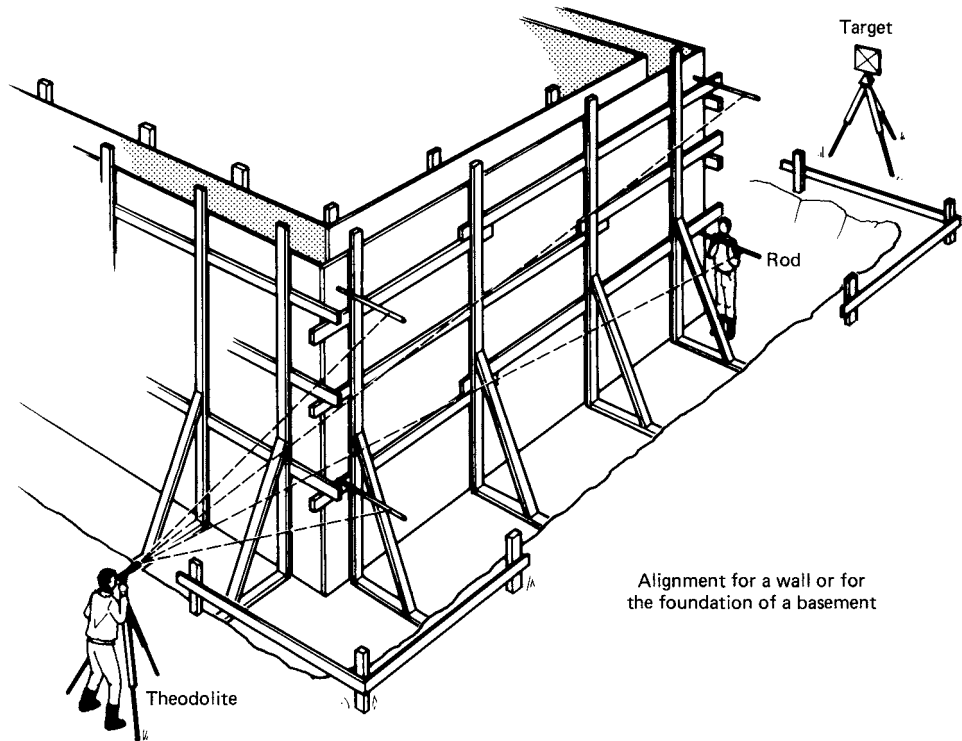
Vertical alignment of walls. (Courtesy of National Swedish Institute for Building Research, FIG Report 69)
